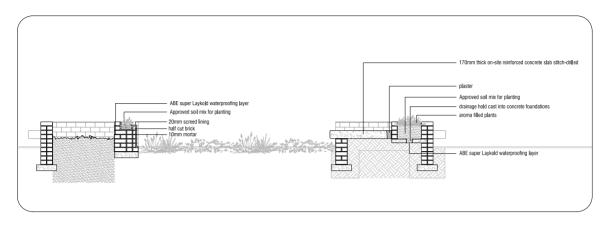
Finalized brick planters abd concrete slab planters. (Author: October 2013)
